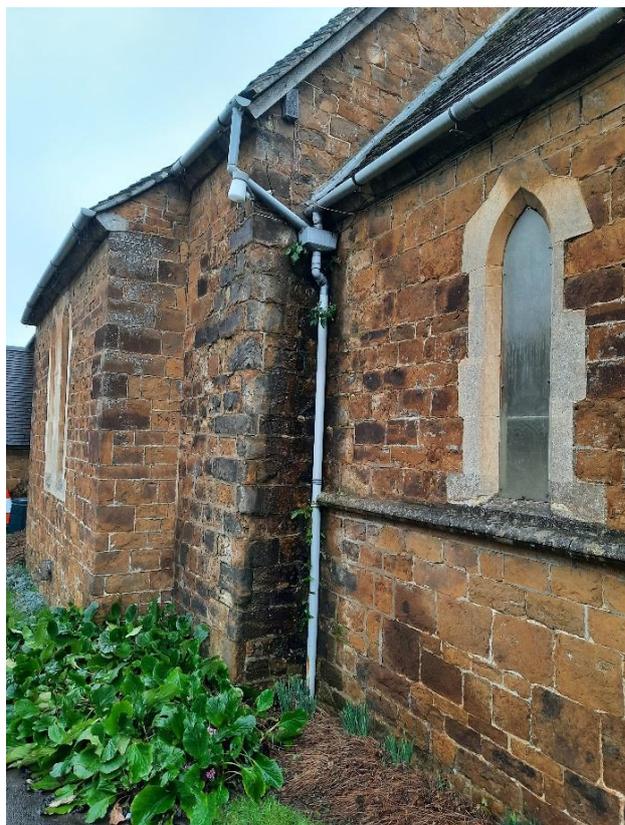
Badly maintained downpipes have led to saturated walls with plants growing out of them...
